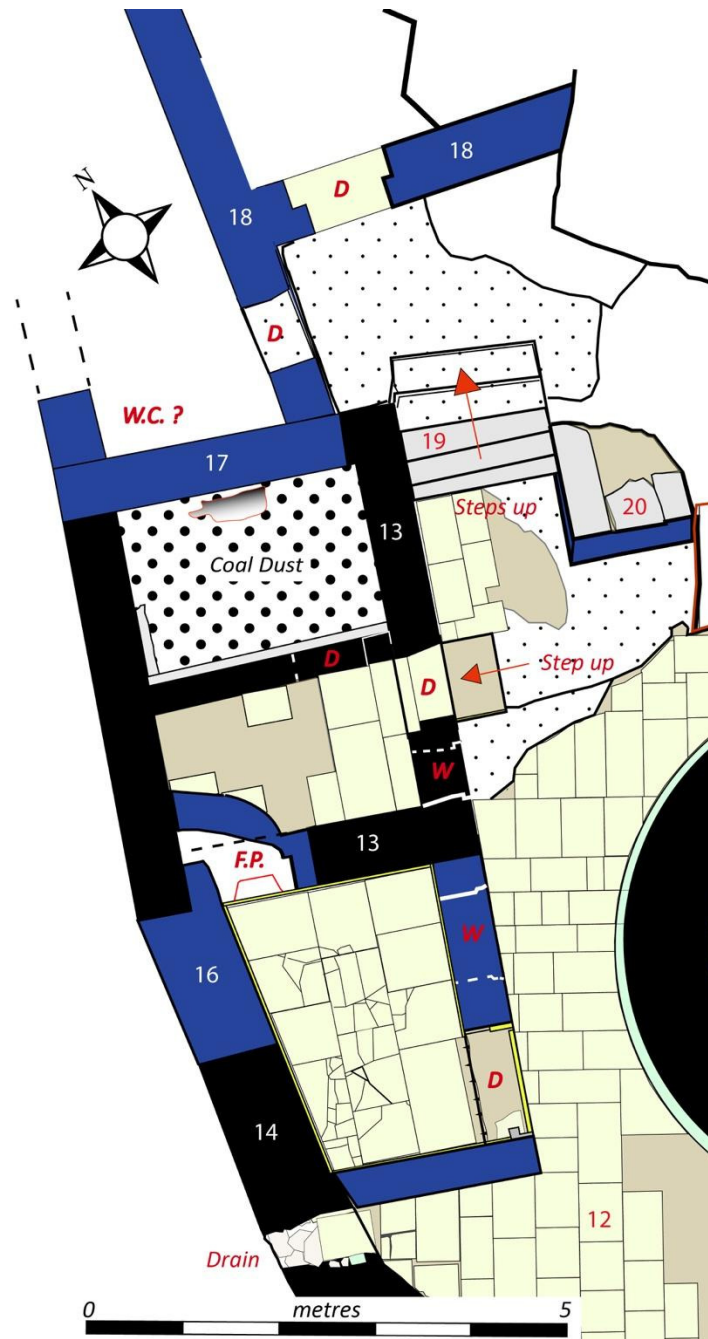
Post excavation plan of the Coal Shed(13), Teacher's Accommodation (16), Toilet (17) and access (18-20) to Northern Terrace
